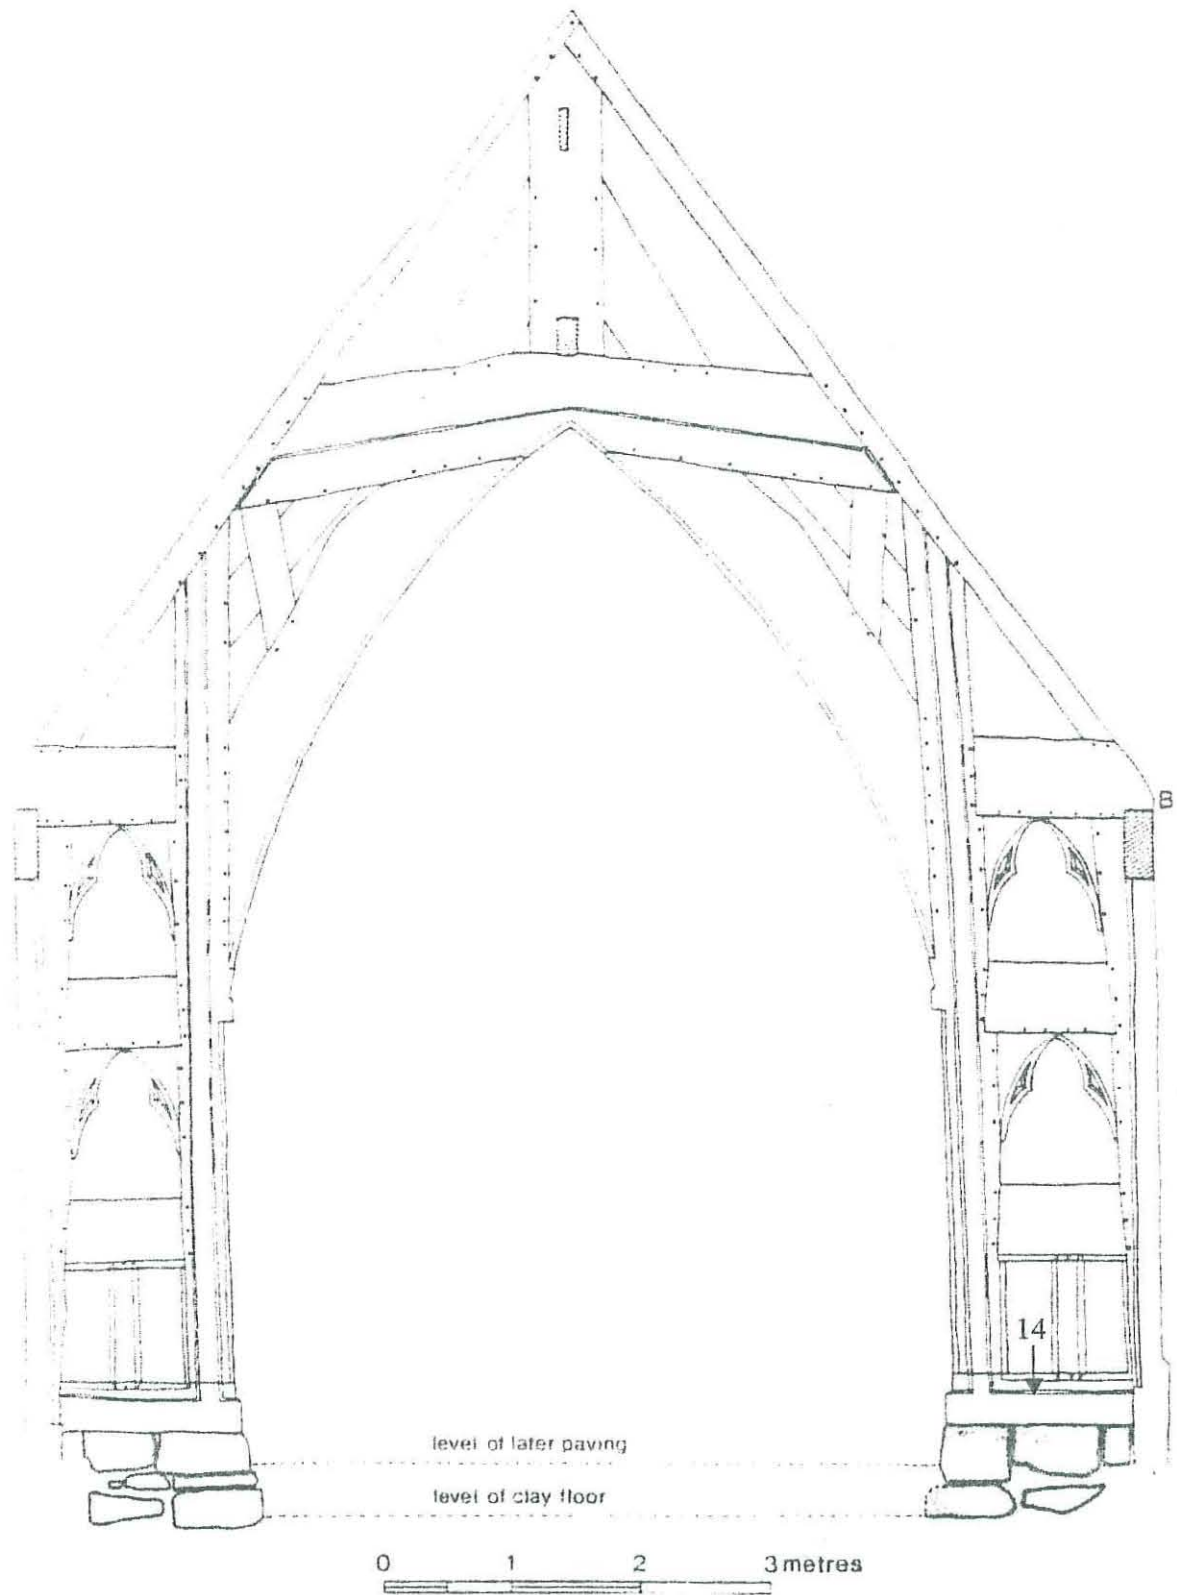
Elevation of the spere truss in the hall range, Baguley Hall. Location of sample 14. (based on figure 8: Dixon *et al* 1989)
